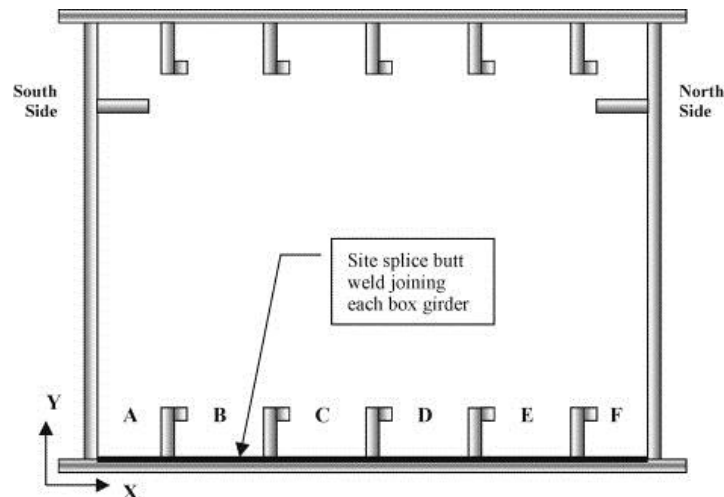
Cross section of one of the box girders (Clubley and Winter, 2003).
